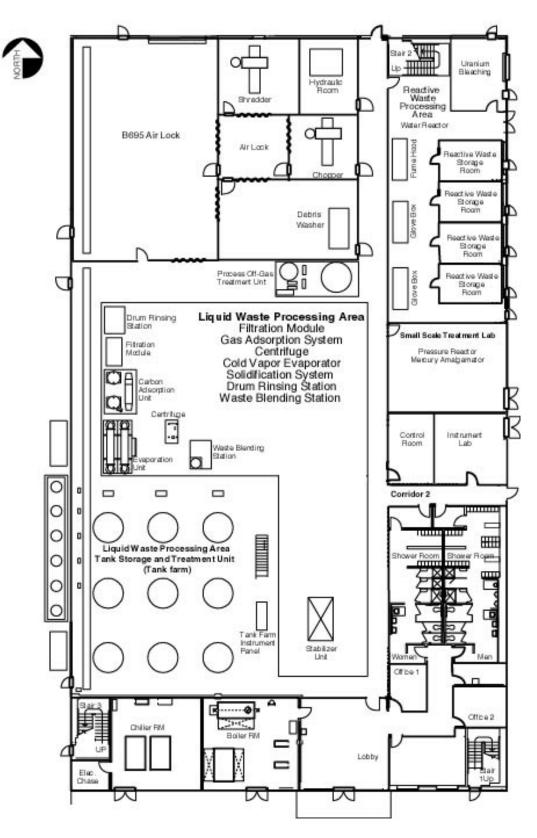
Building 695 general arrangement of rooms, process equipment and tank farm
